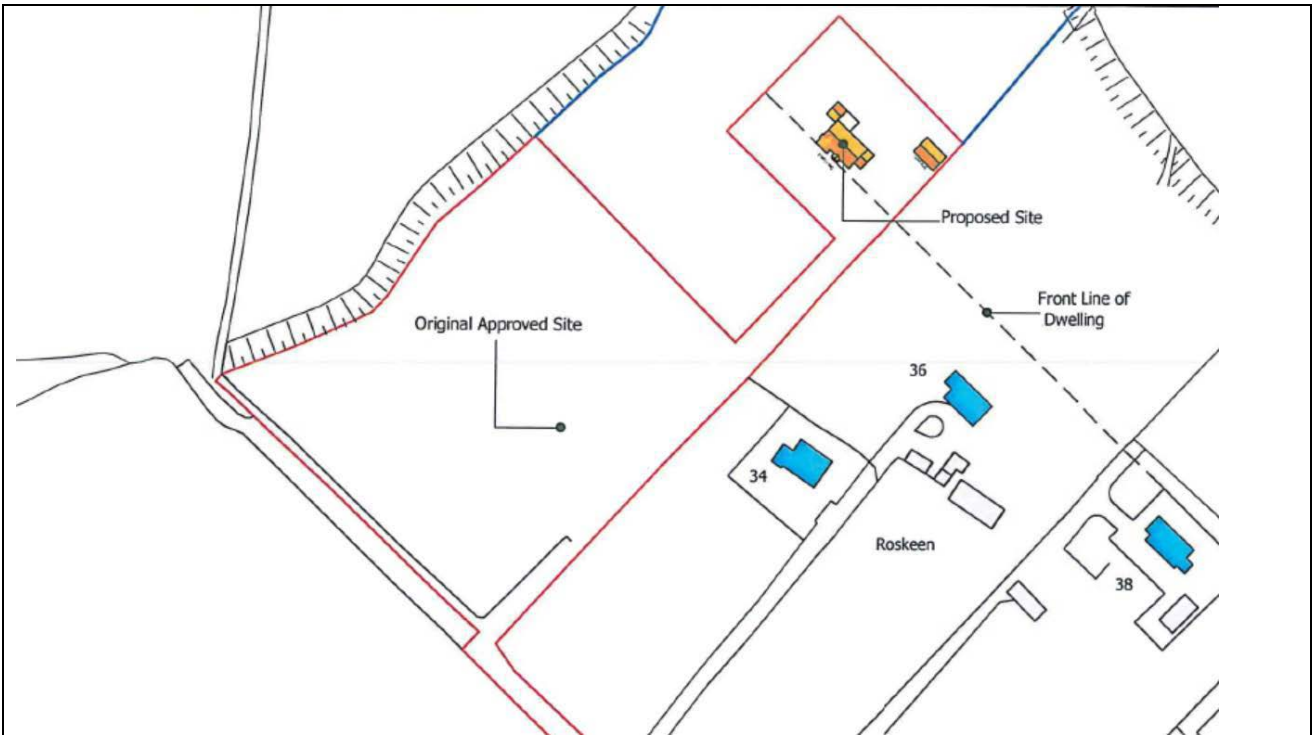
Current site location plan showing approx. location of previously approved dwelling and garage; and location of the change of house type including garage proposed.
